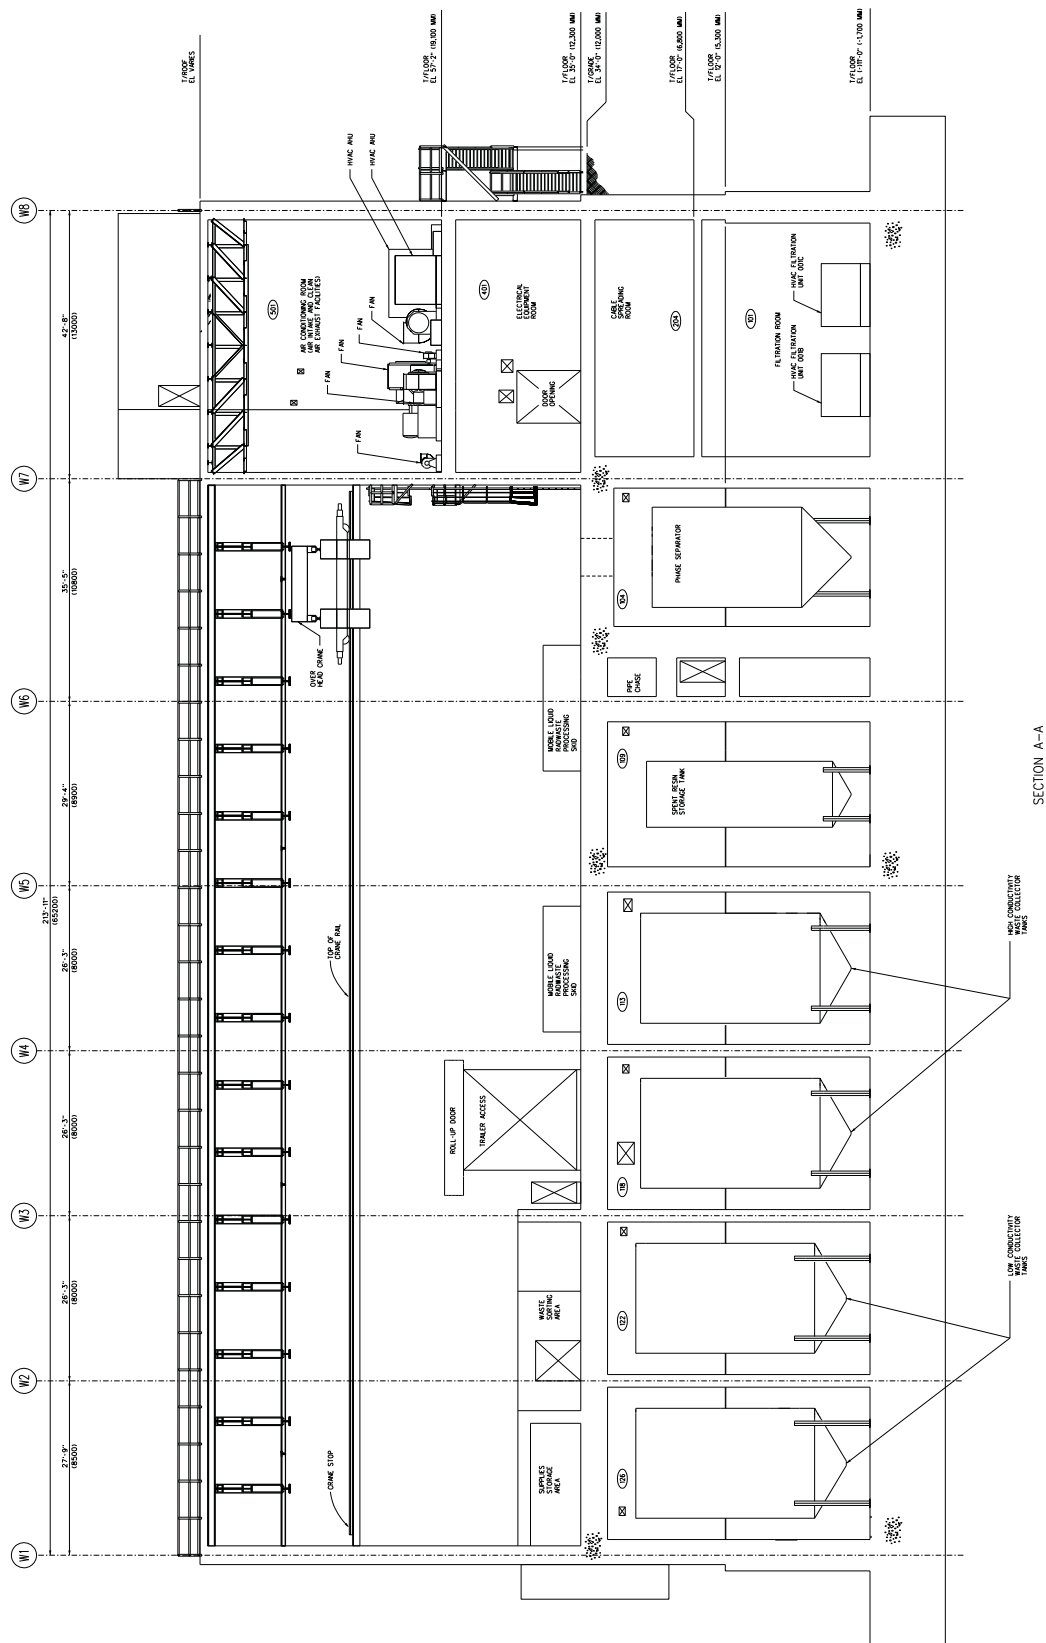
E RADWASTE BUILDING, SECTIONS A-A, B-B (SHEET 1)
